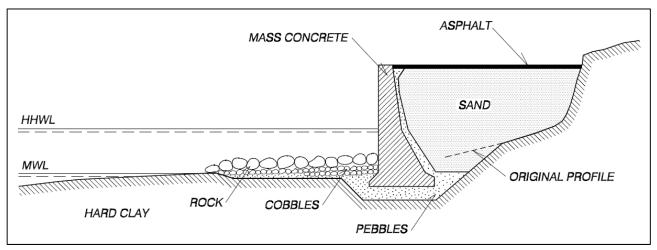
Typical section view of a vertical seawall (USACE, 2006)
